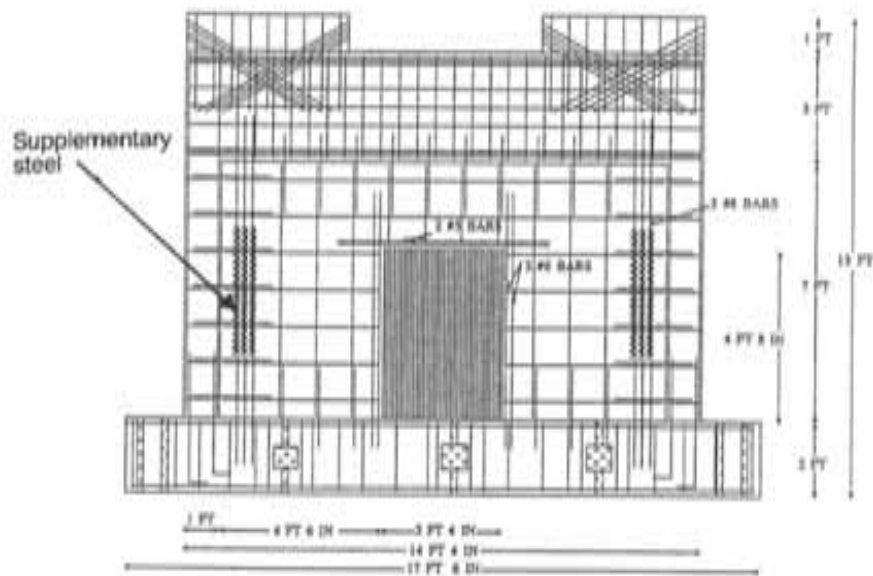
Reinforcement layout for test specimen retrofitted by Shah [33] with cast-in-place infill wall and supplementary tensile reinforcement in boundary element region
